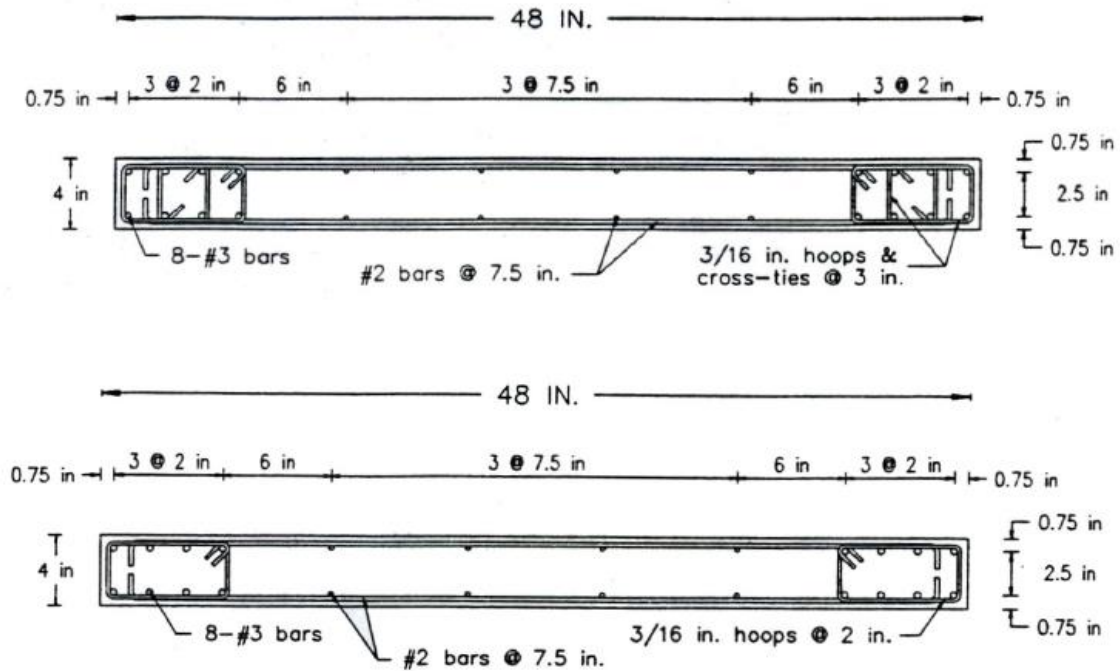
Section of Rectangular Walls RW1 and RW2 Tested by Thomsen and Wallace (1995) (1in = 2.54cm)
